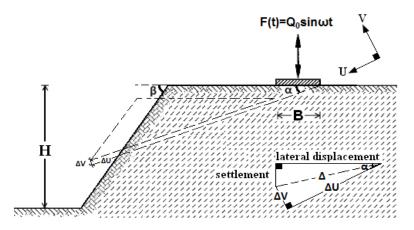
Planar failure surface and displacement occur in the failed wedge due to the vertical cyclic loading applied to the foundation
